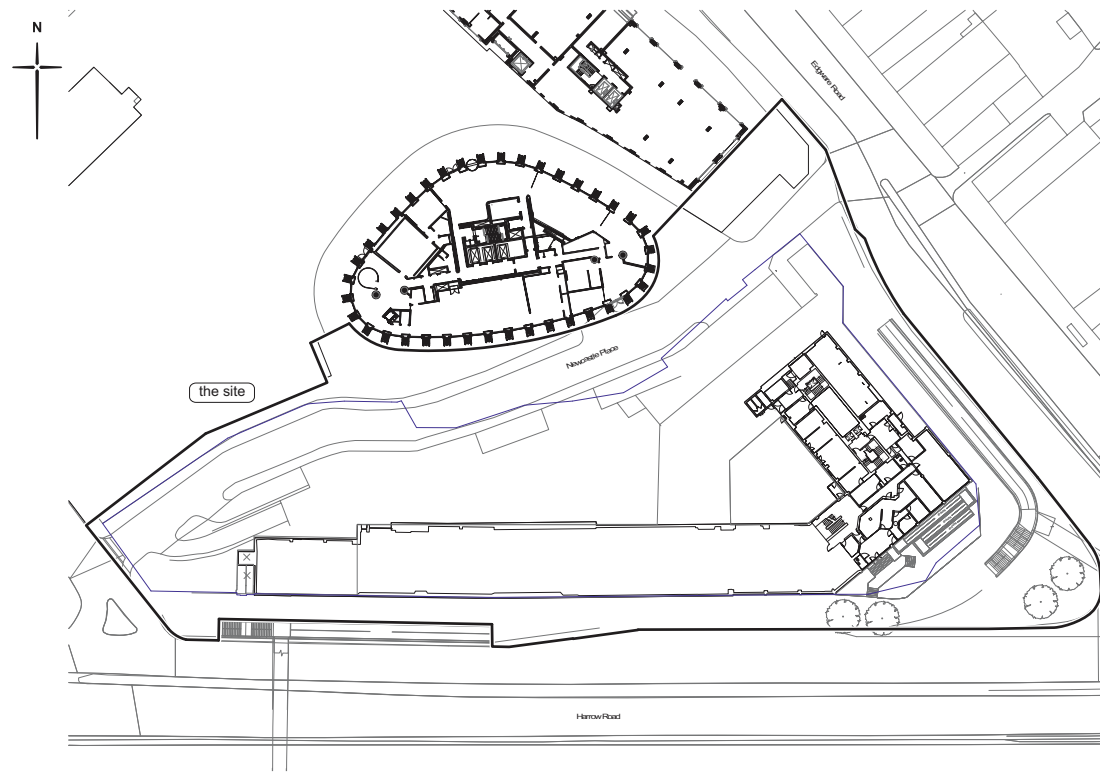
Existing Ground Floor Plan, 15044-SQP-ZZ-00-DP-A-PL01003, Rev. P1; 07/10/2020
